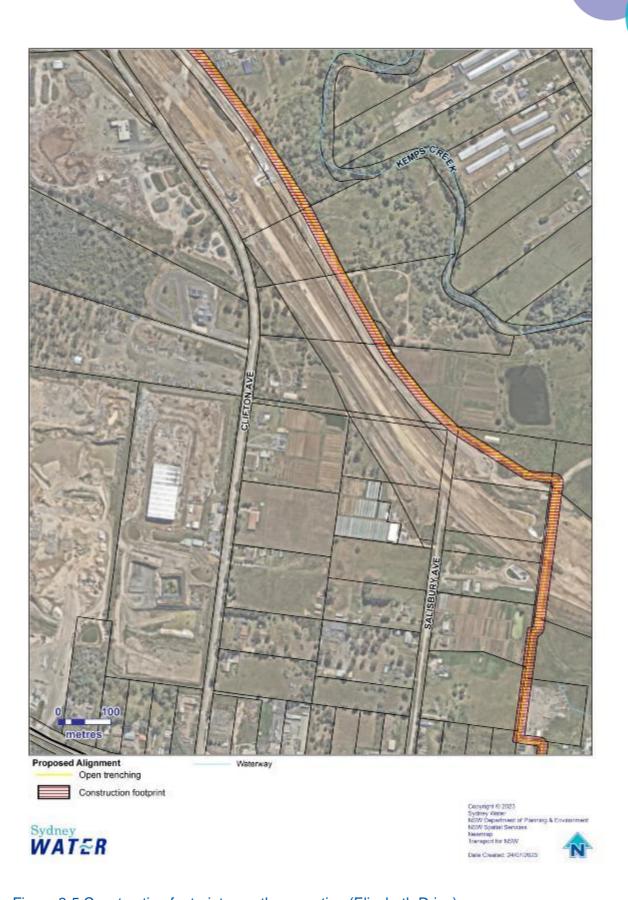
Construction footprint – northern section (Elizabeth Drive)
